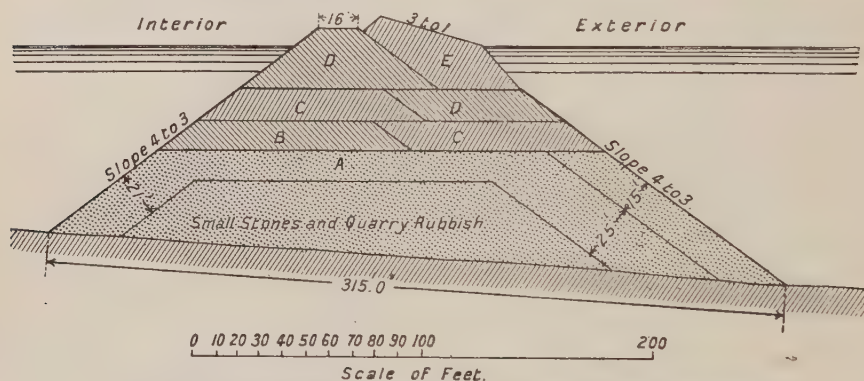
Section of Breakwater Extension, Grand Jetée, Marseilles
